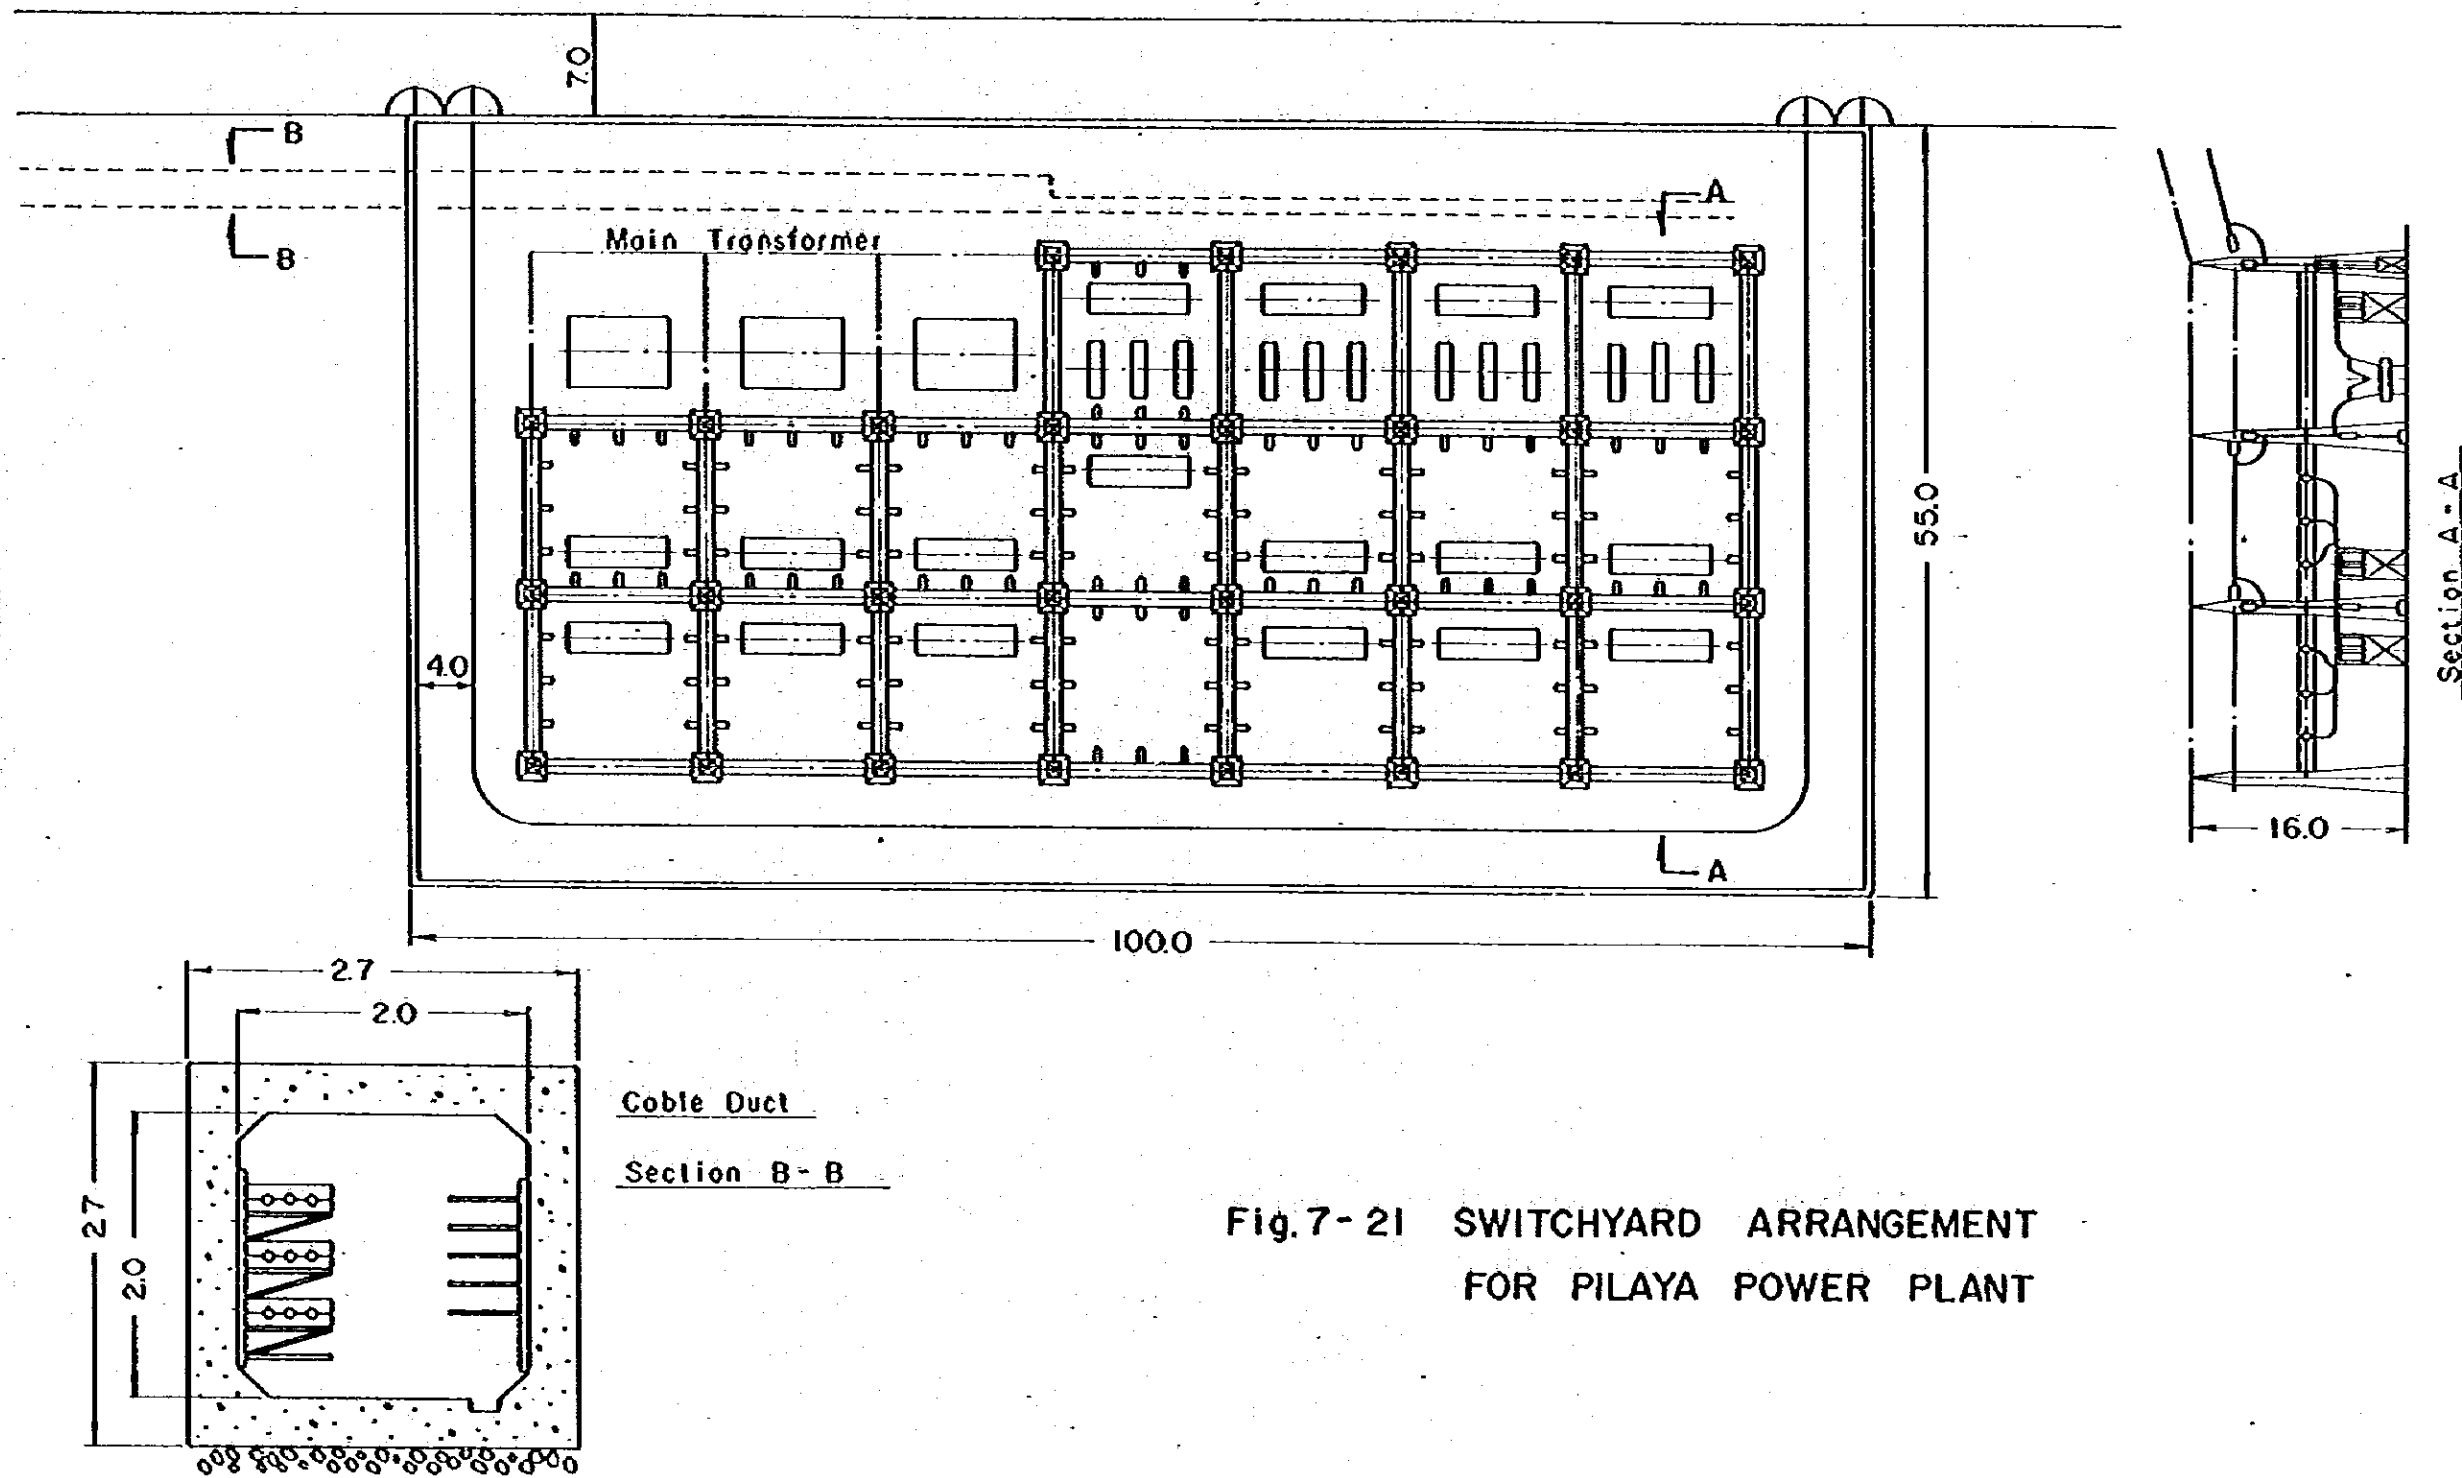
21 SWITCHYARD ARRANGEMENT FOR PILAYA POWER PLANT
